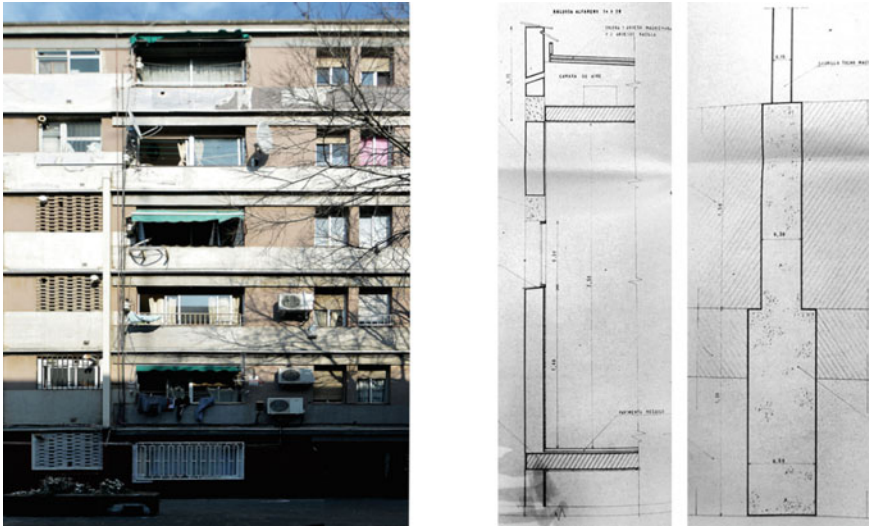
Examples of Type 4 buildings' façade details (Rosello 2011)
